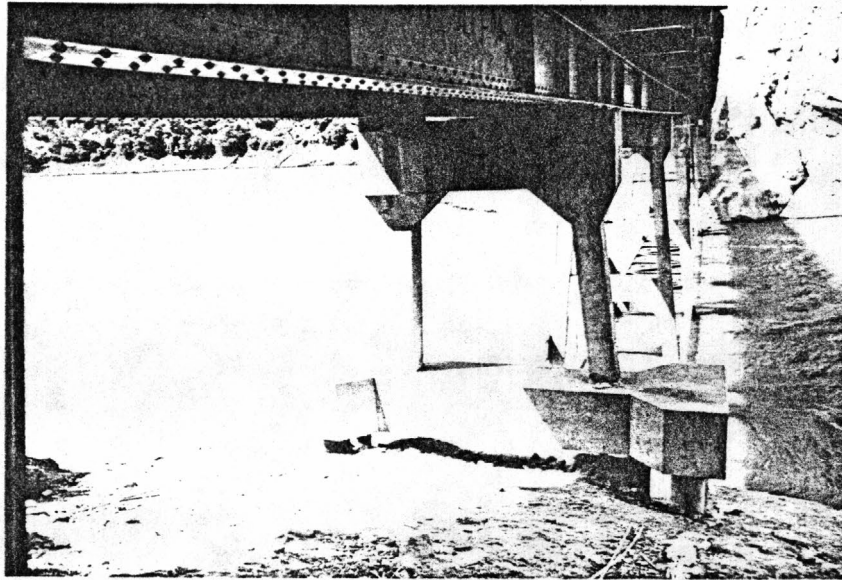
Spalled post added to strengthen the Cochrane Bridge (near location (69)) after a creeping segment of the Calaveras was discovered to be twisting the bridge.
